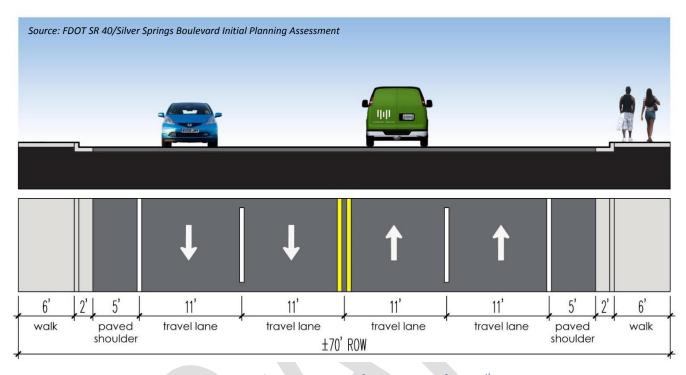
Existing Typical Cross-Section of SR 40 west of NE 60th Court
